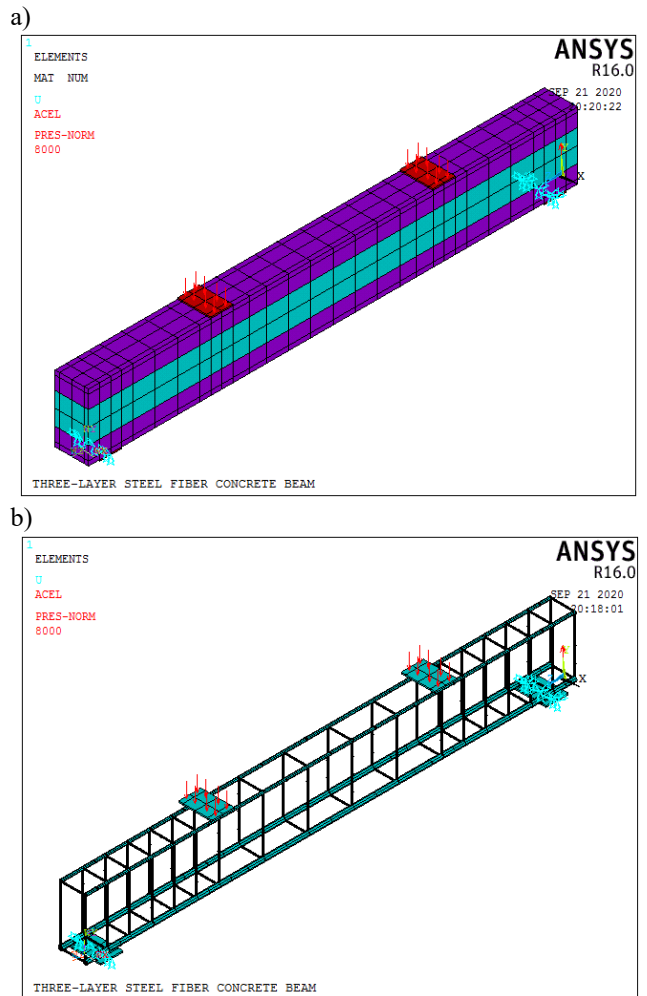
Three-layer concrete beam model in ANSYS: a) model of three-layer concrete beam, b) Modeling of steel bars in concrete beams
